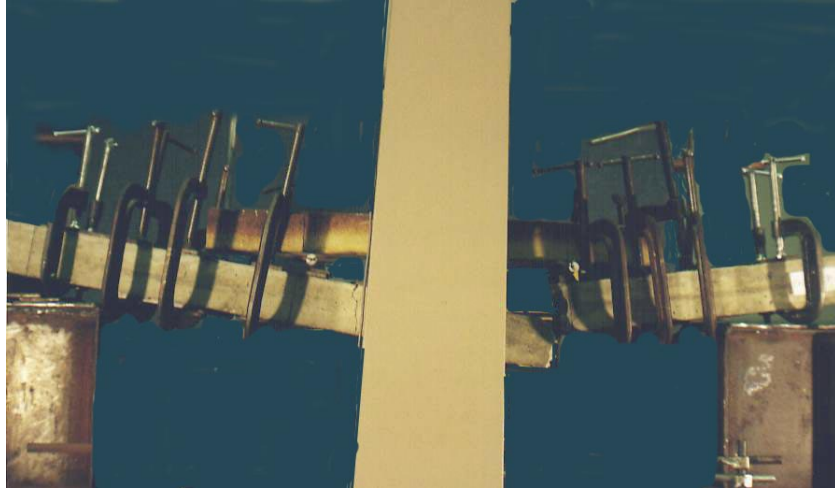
Failed Beam Specimen Reinforced with 10-mm DHFRP Bars.
